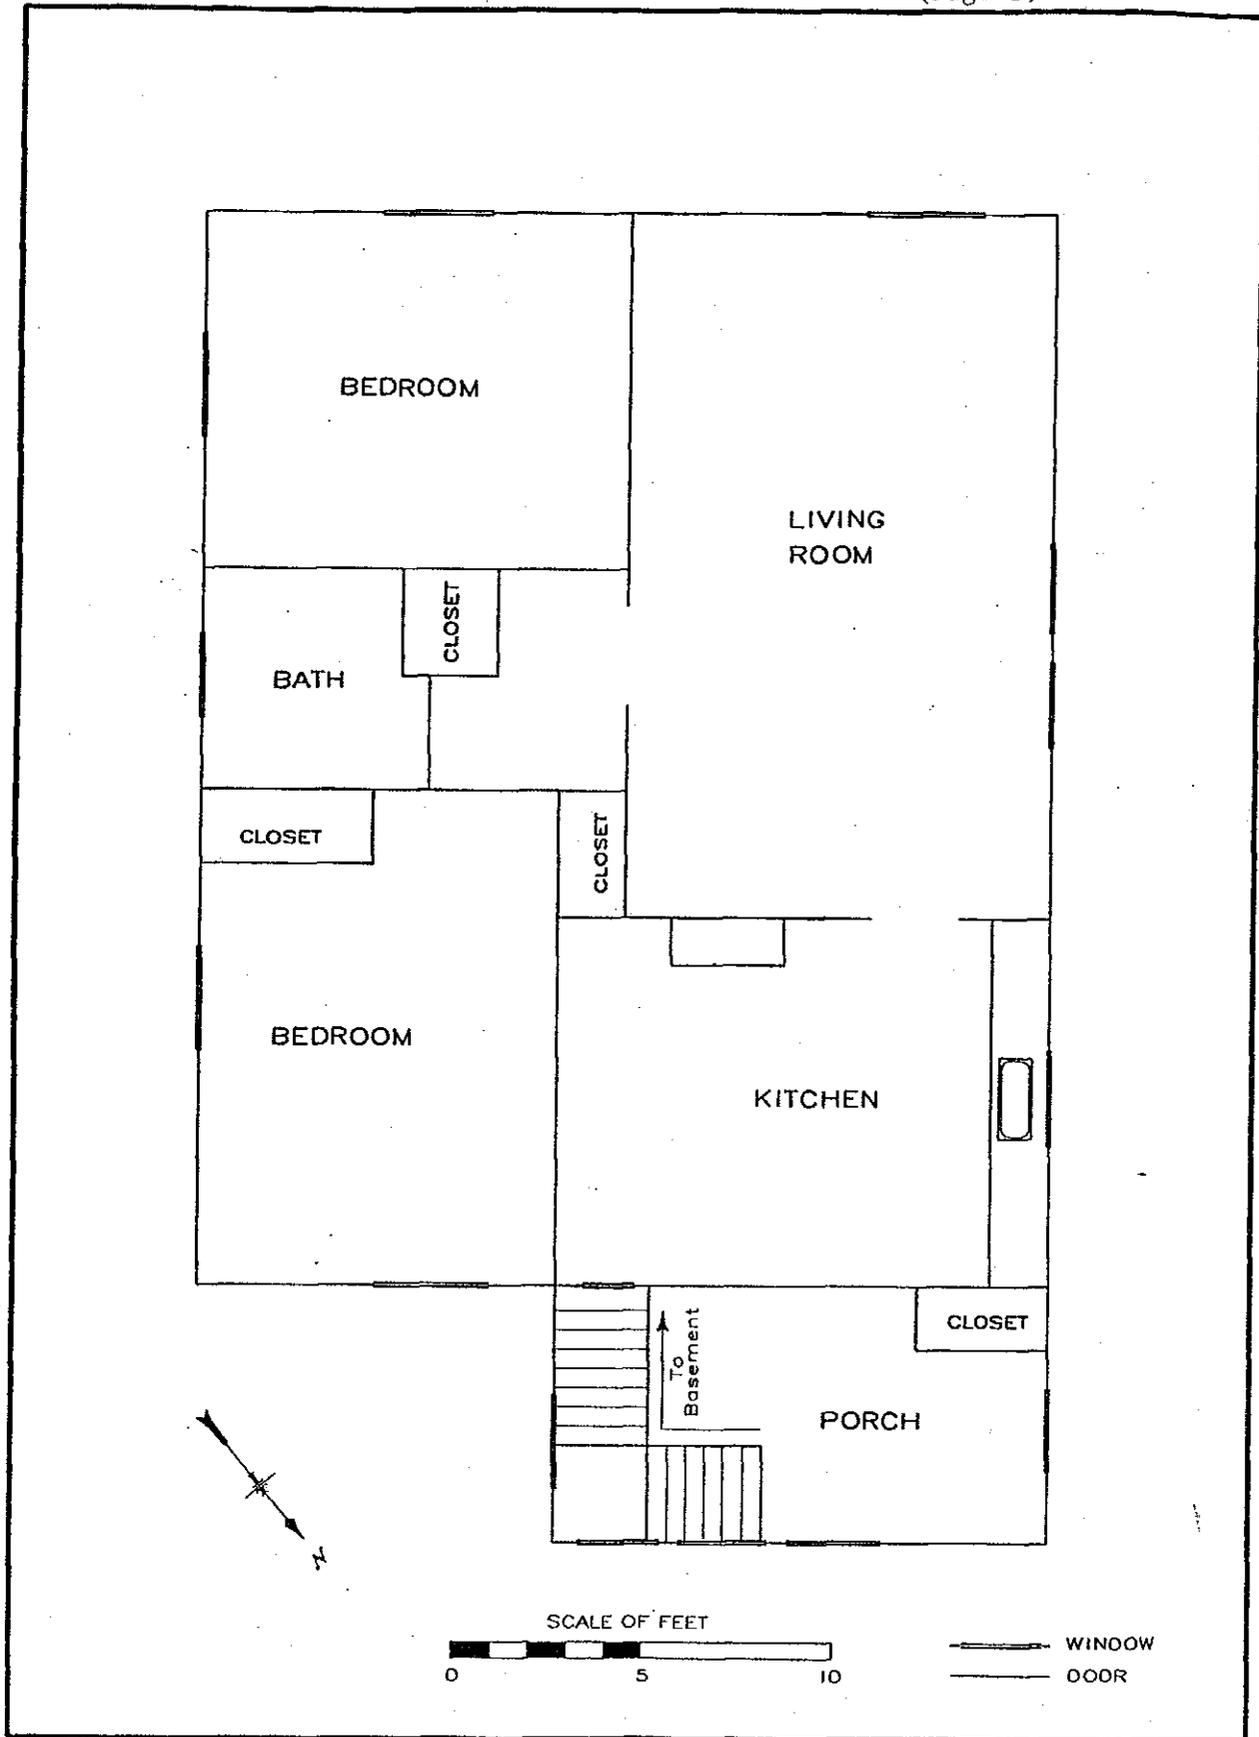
Floor Plan of the Lost River Diversion Dam Control House.
